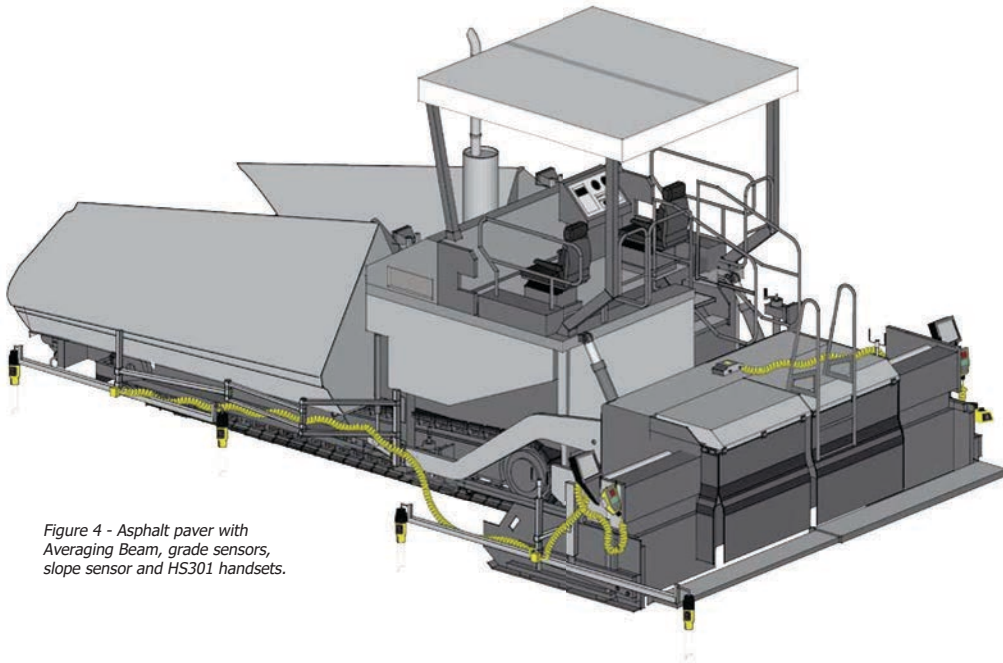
Asphalt paver with Averaging Beam, grade sensors, slope sensor and HS301 handsets.
